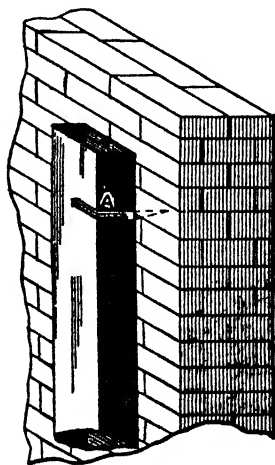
Square Pipe Fastened Against a Wall with Hook Shown in Fig. 38
